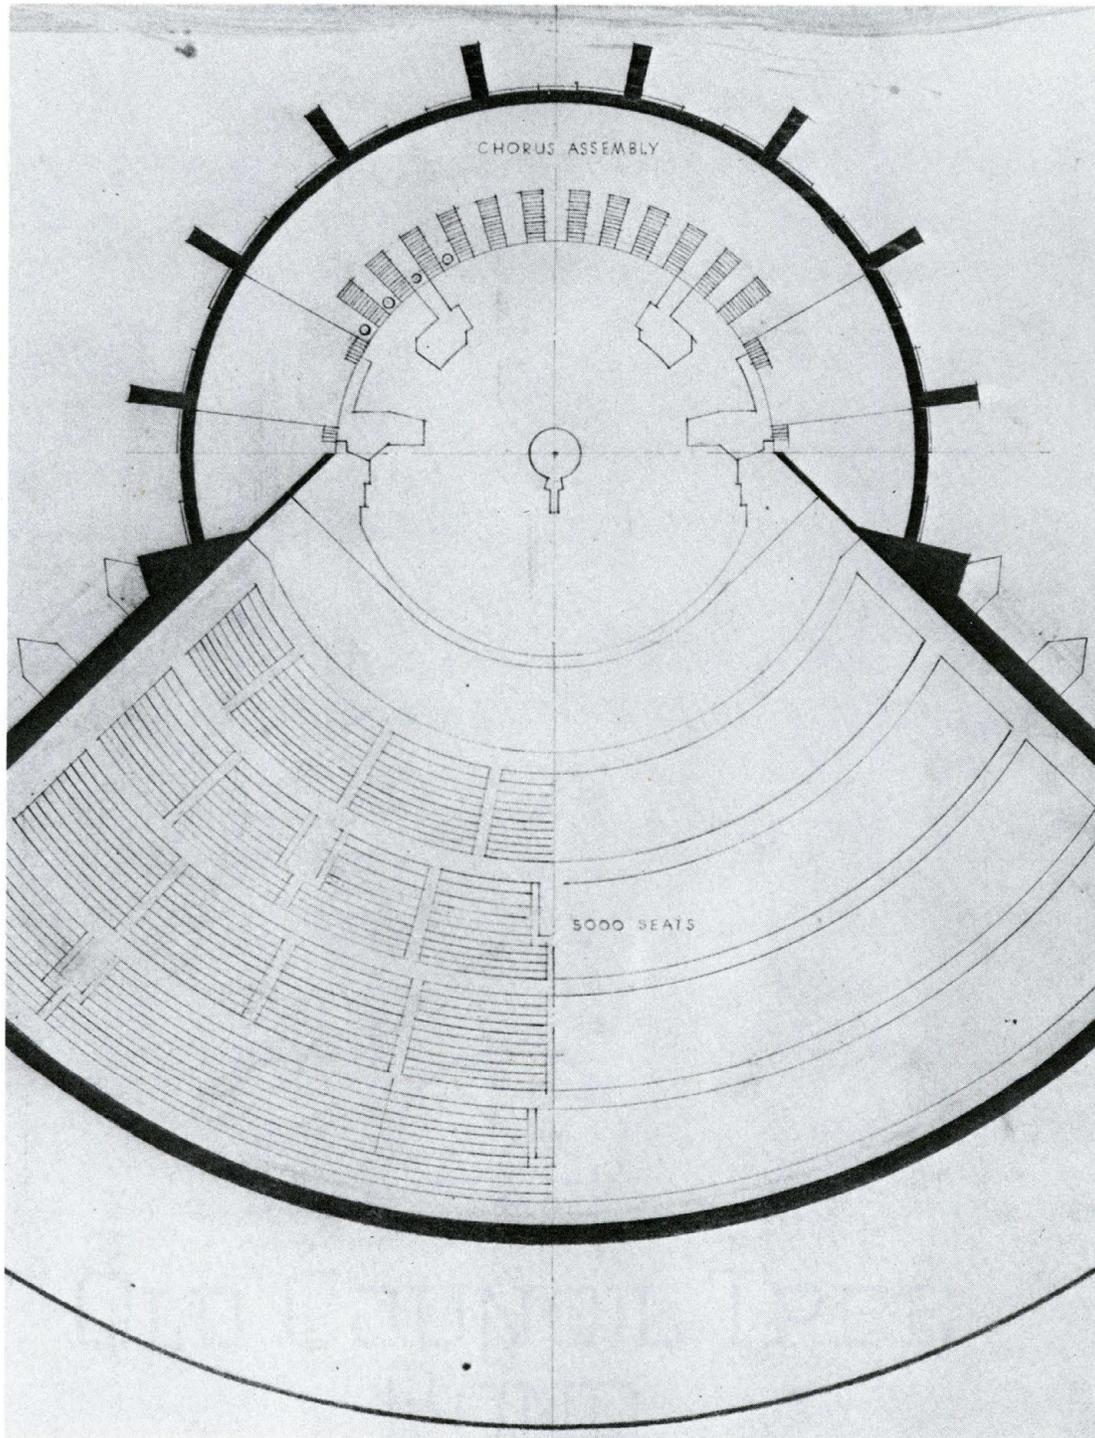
Elevation of The Divine Comedy theatre groundplan.
